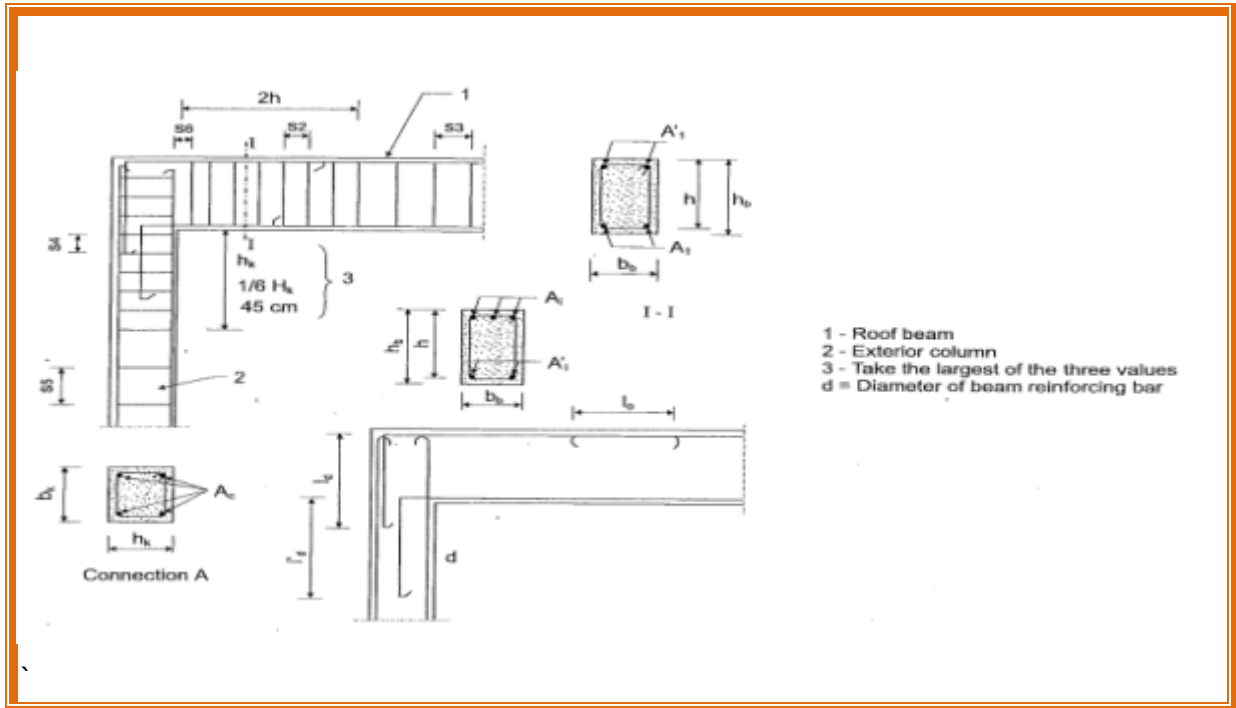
Connection between roof beam and exterior column (Kaikan K. (2001))
